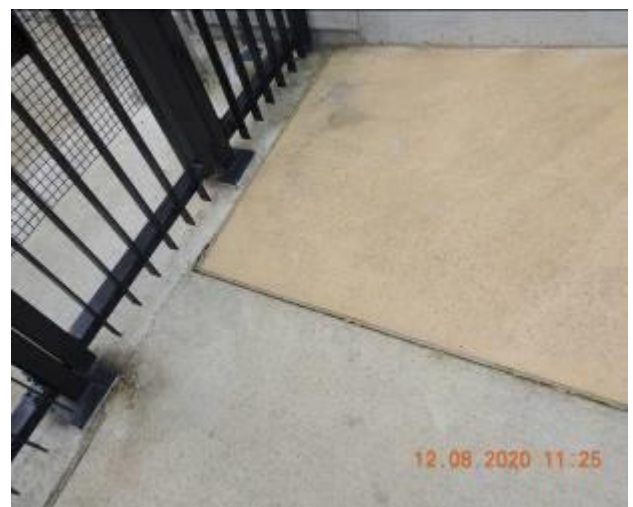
Crack propagation and loss of material through footpath pavement
